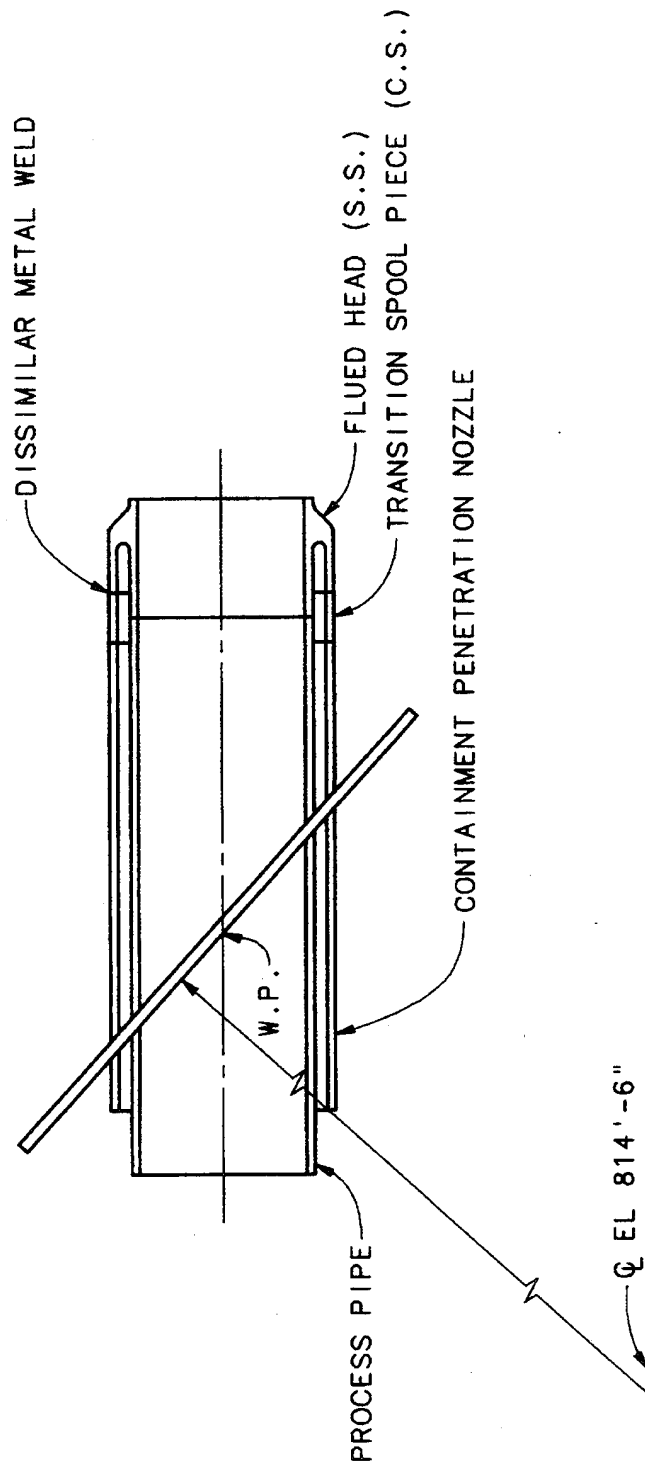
Type VIII, for Butt Weld C.S. Process Lines
